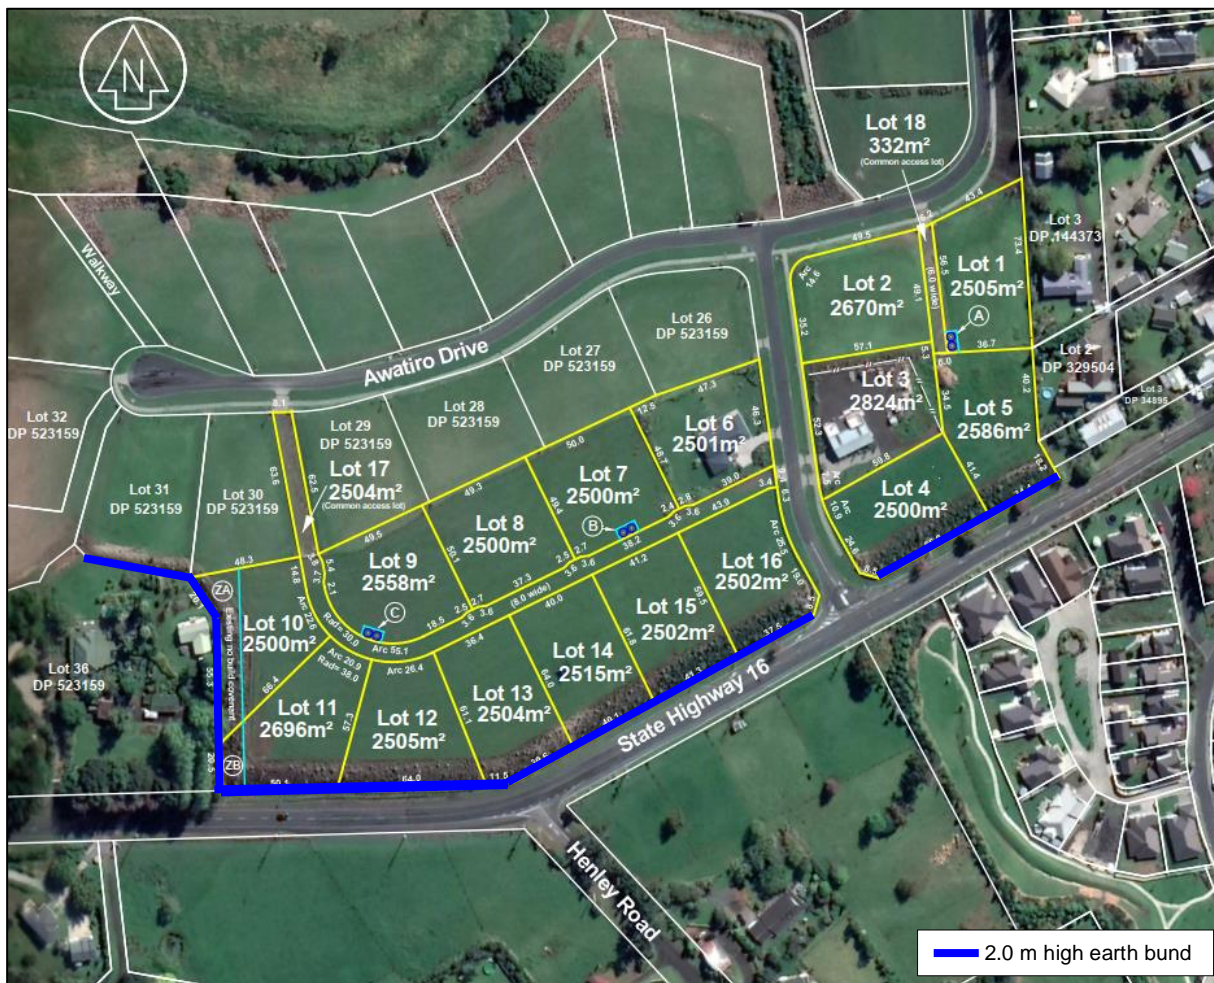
Site plan for the residential development at 787 Kaipara Coast Highway
